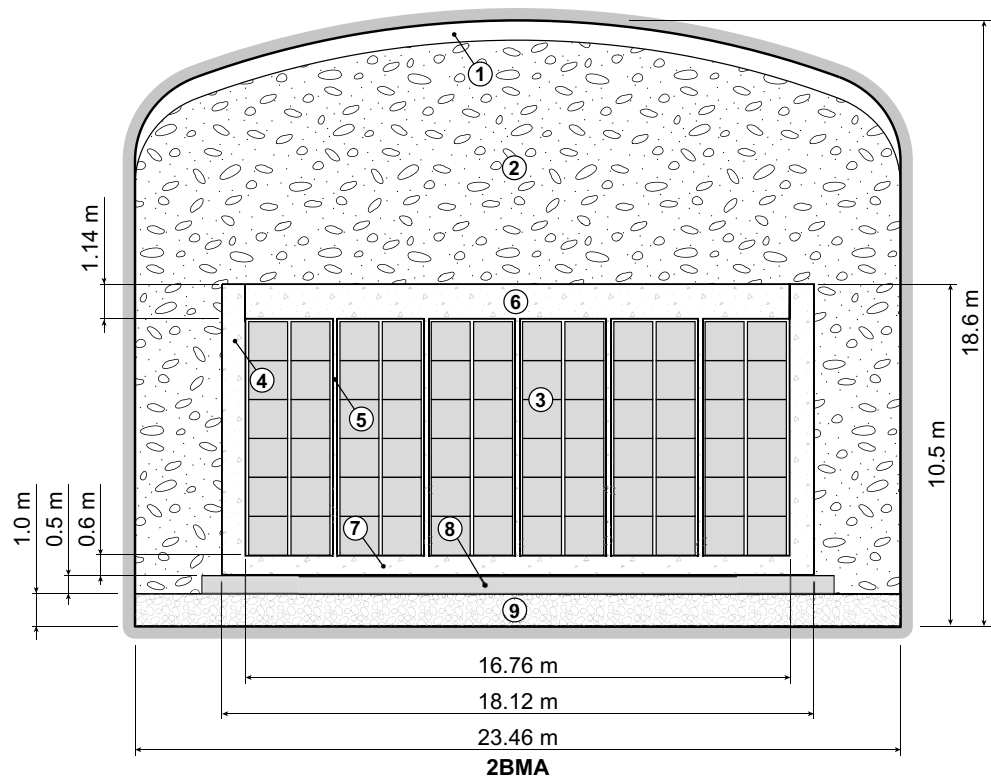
Schematic cross-section of 2BMA at closure. Key to numbering: 1) Void 2) Macadam backfill 3) Waste domain 4) Outer wall 5) Inner wall 6) Lid 7) Caisson slab 8) Slab 9) Crushed rock.
